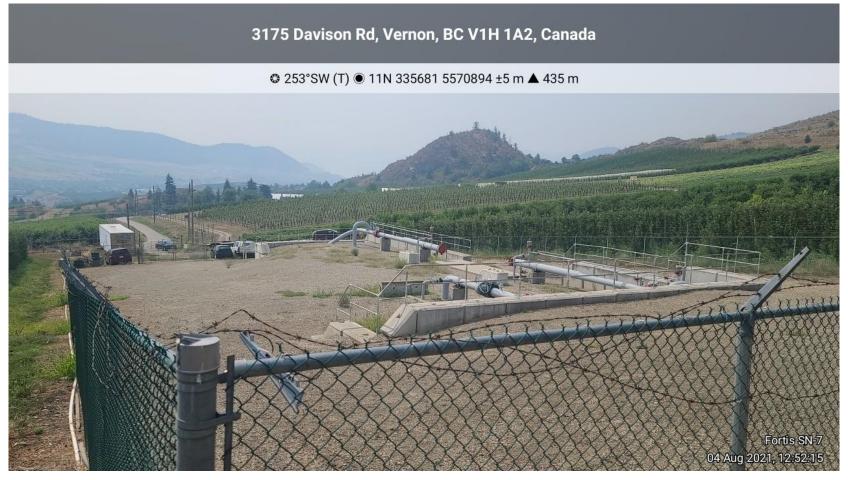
Facing south over the SN 7 station, note the parking area in the background is the site access as well as the receiving environment for site drainage.
